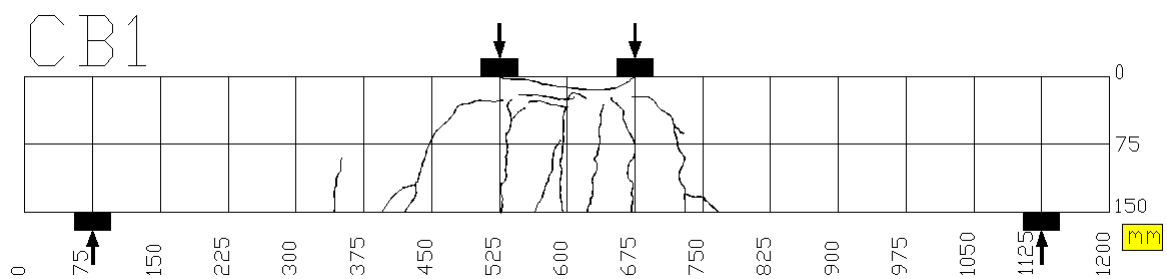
Crack Pattern for Beam (CB1) At Failure
